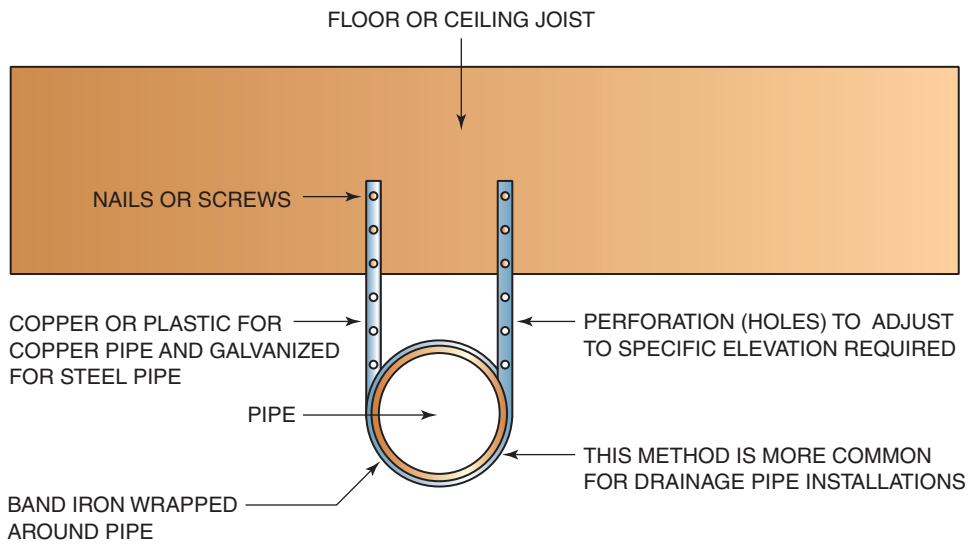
Band iron is also known as strapping. It can be used to install piping in various positions and anchors to the structure with screws or nails.
